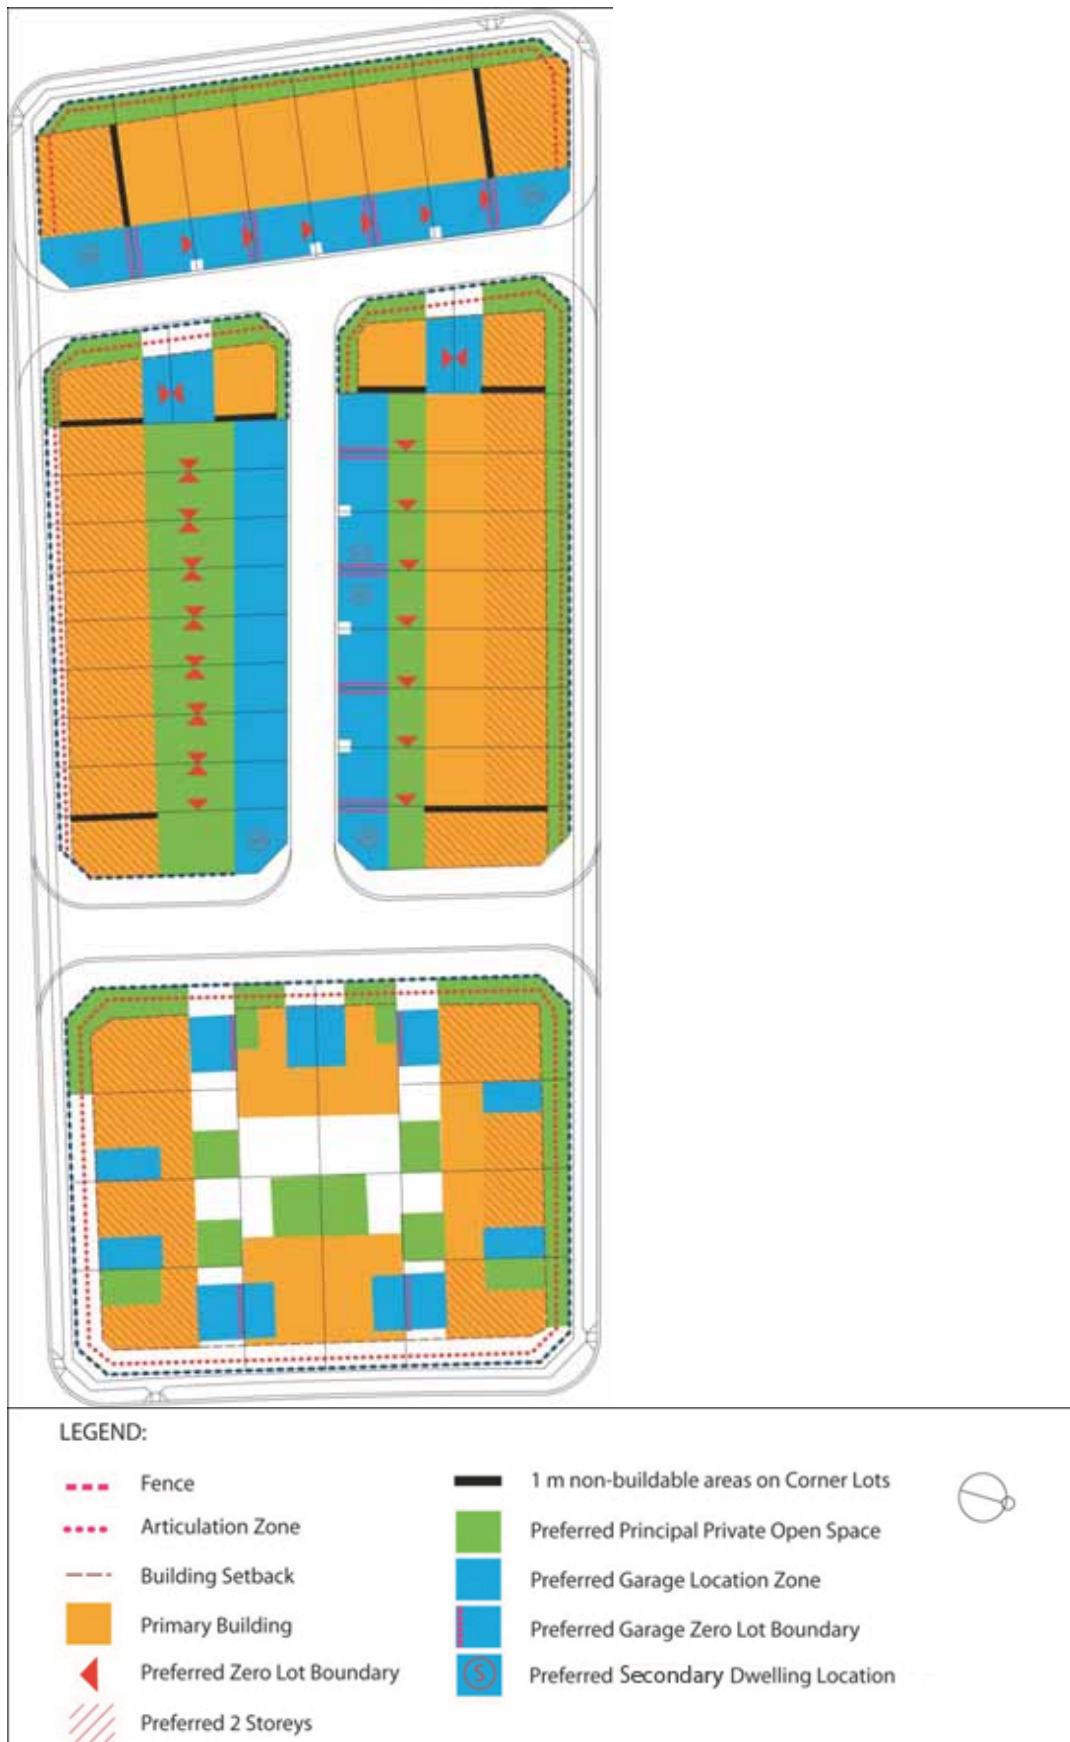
Typical Example of a Building Envelope and Siting Plan (BESP)
